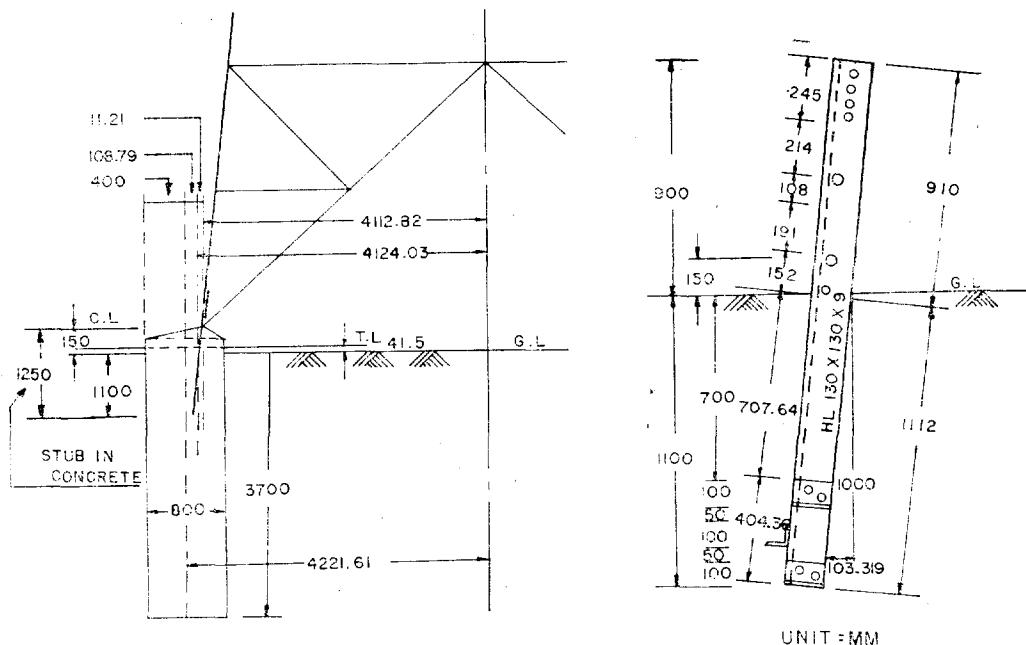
Stub setting detail YEM-008 "DA" extention 16.5m tower.
